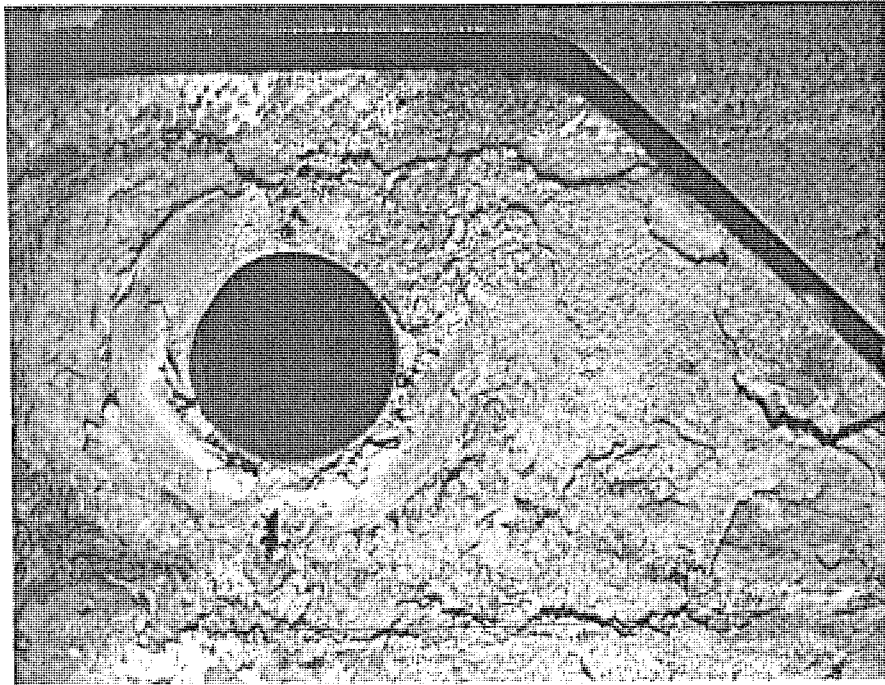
Pack rust deposits left on beam end after the link plate and pin were removed with a cutting torch.
